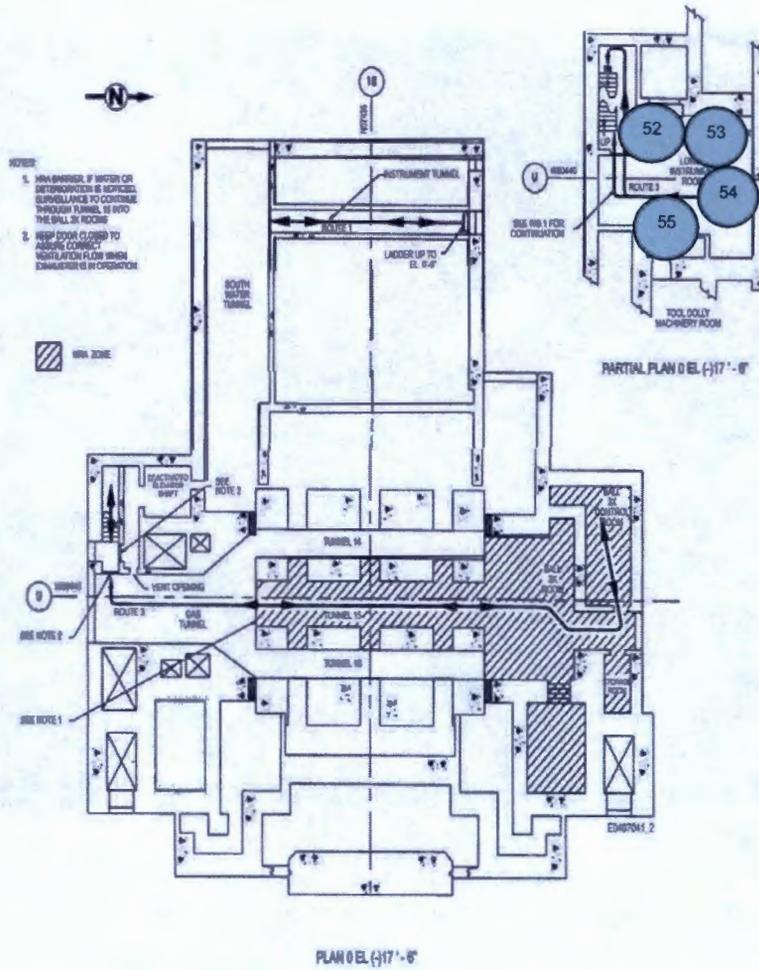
Interior Building Inspection Map, Elevation -17'-6".
